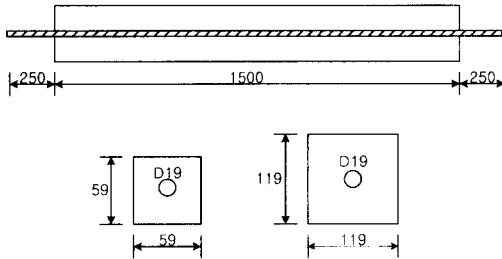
Details of the reinforced concrete direct tension (unit mm)
